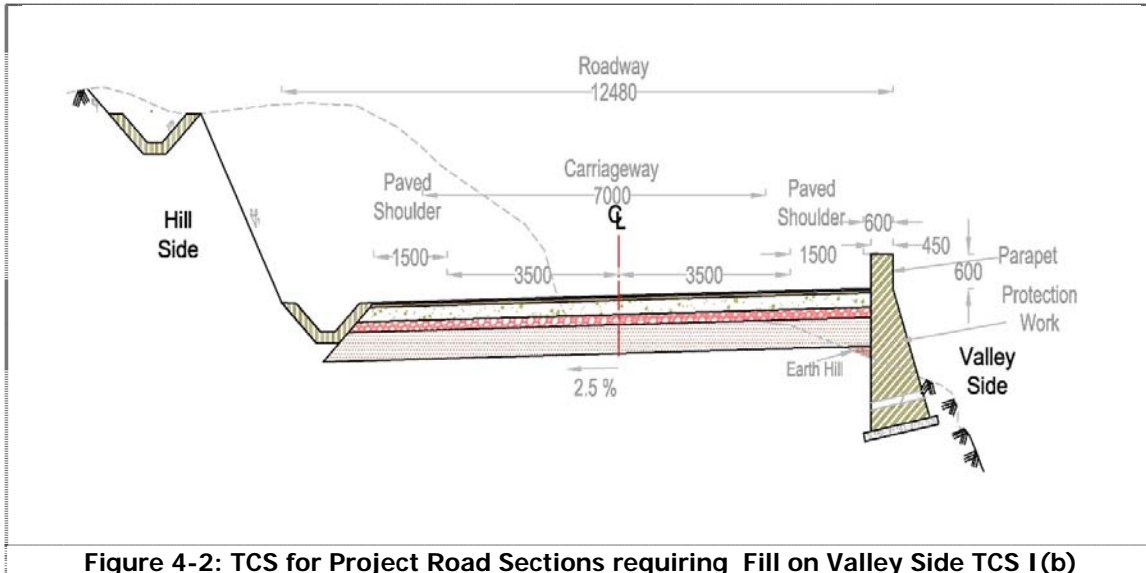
TCS for Project Road Sections requiring Fill on Valley Side TCS I (b)
